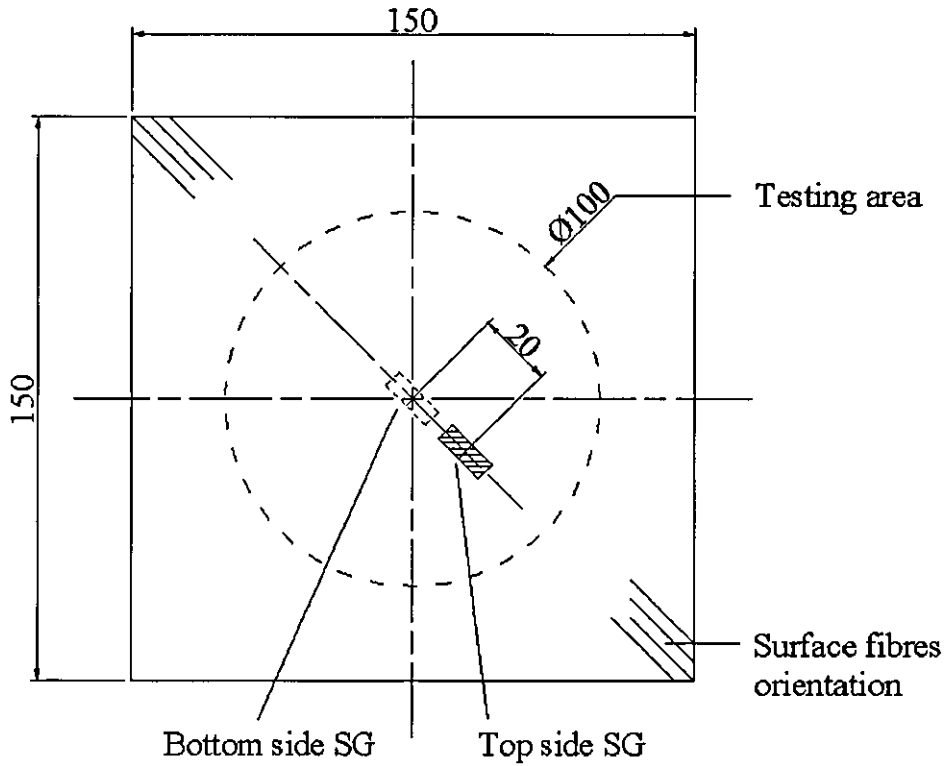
Specimen dimensions and strain gauge (SG) locations for transverse load.
